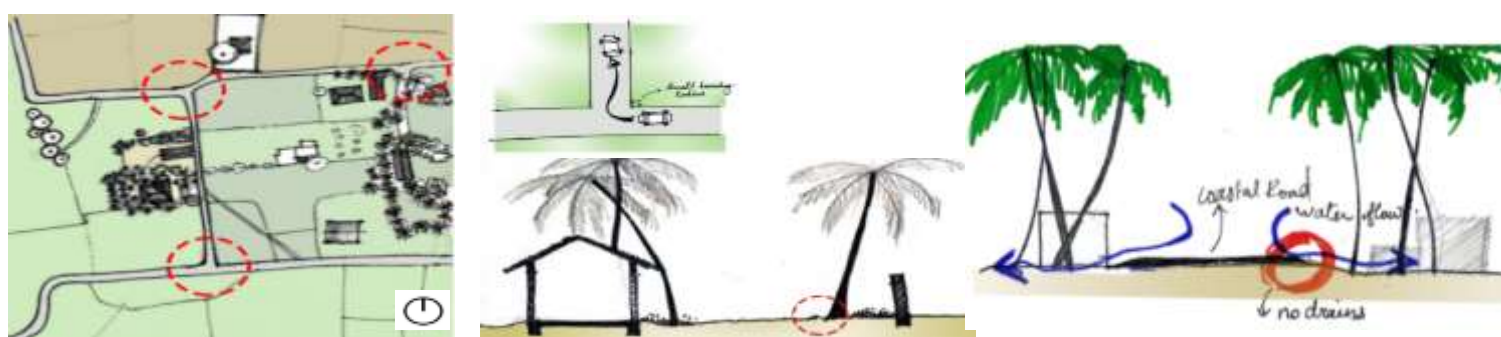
Detail at A on Key plan on Figure 8.11 (Inadequate turning radius issues and mud roads with no drainage for storm water, narrow roads)
